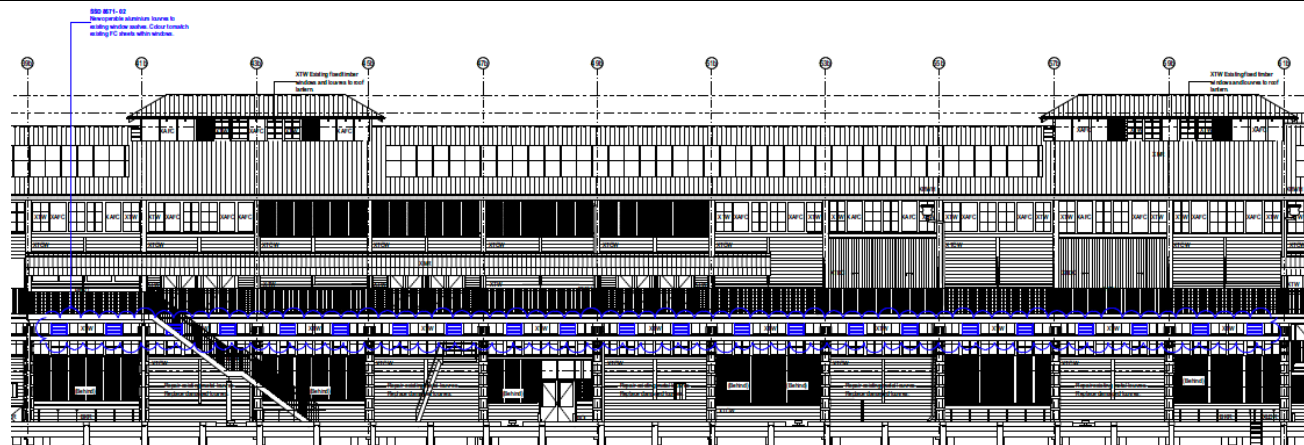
proposed eastern façade (Plan A-222, 24/01/22)
